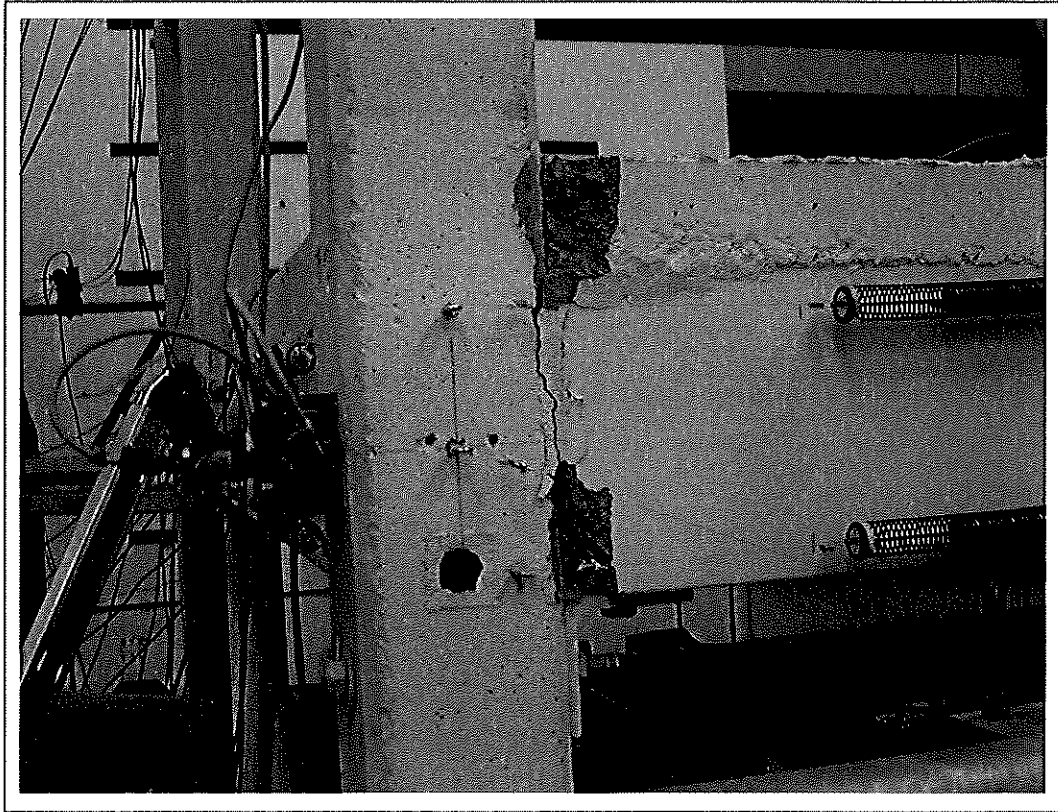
Detail of the beam-column connection after the test (J3-Trans.)
